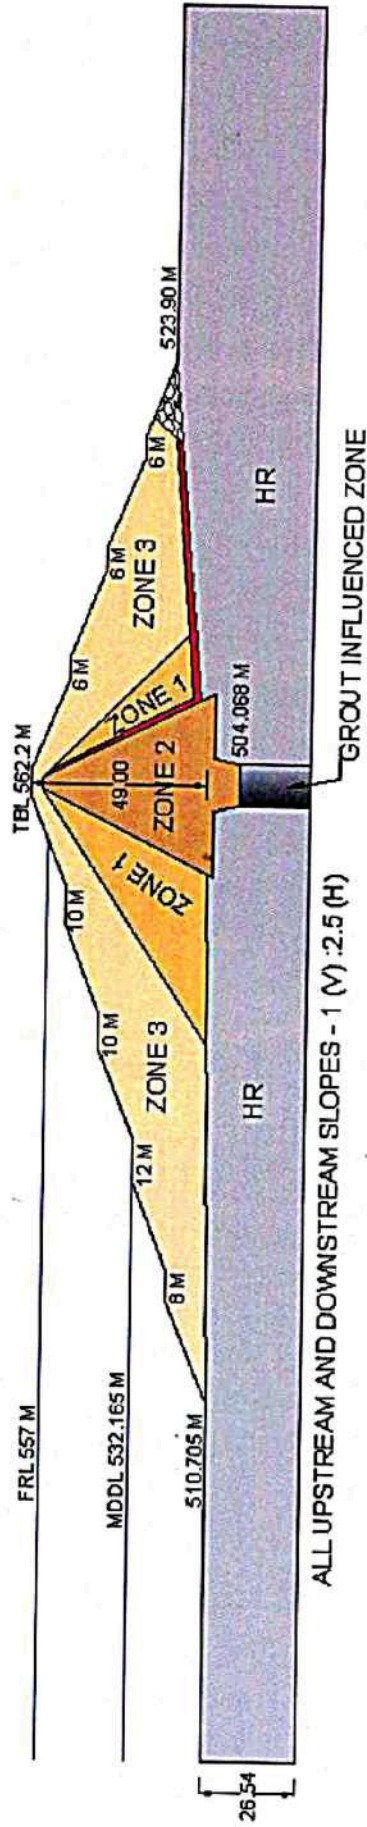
Design dam section 'III' (Hillock portion at Ch. 16.3 km)
